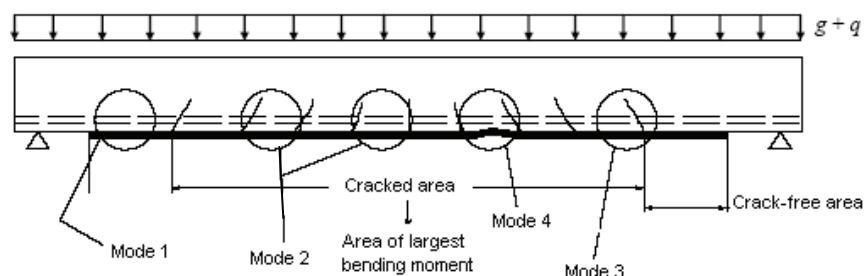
FRP flexural strengthening: debonding failure modes
